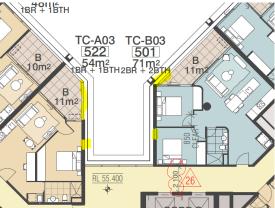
Overlooking between Apartments 501 and 522 of Building C
